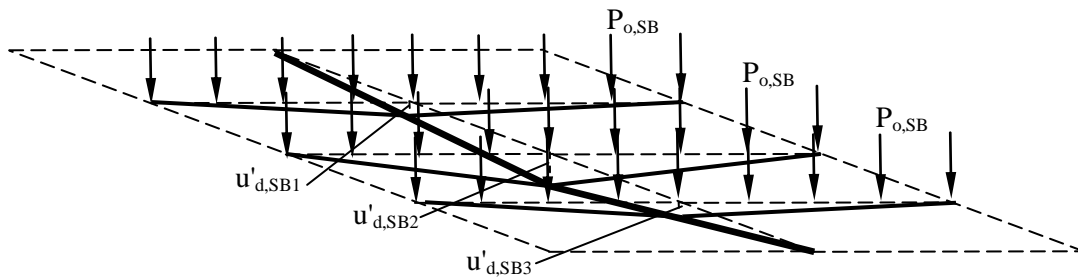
Plan view of the grillage system subject to upper floor impact (dimensions in mm).
